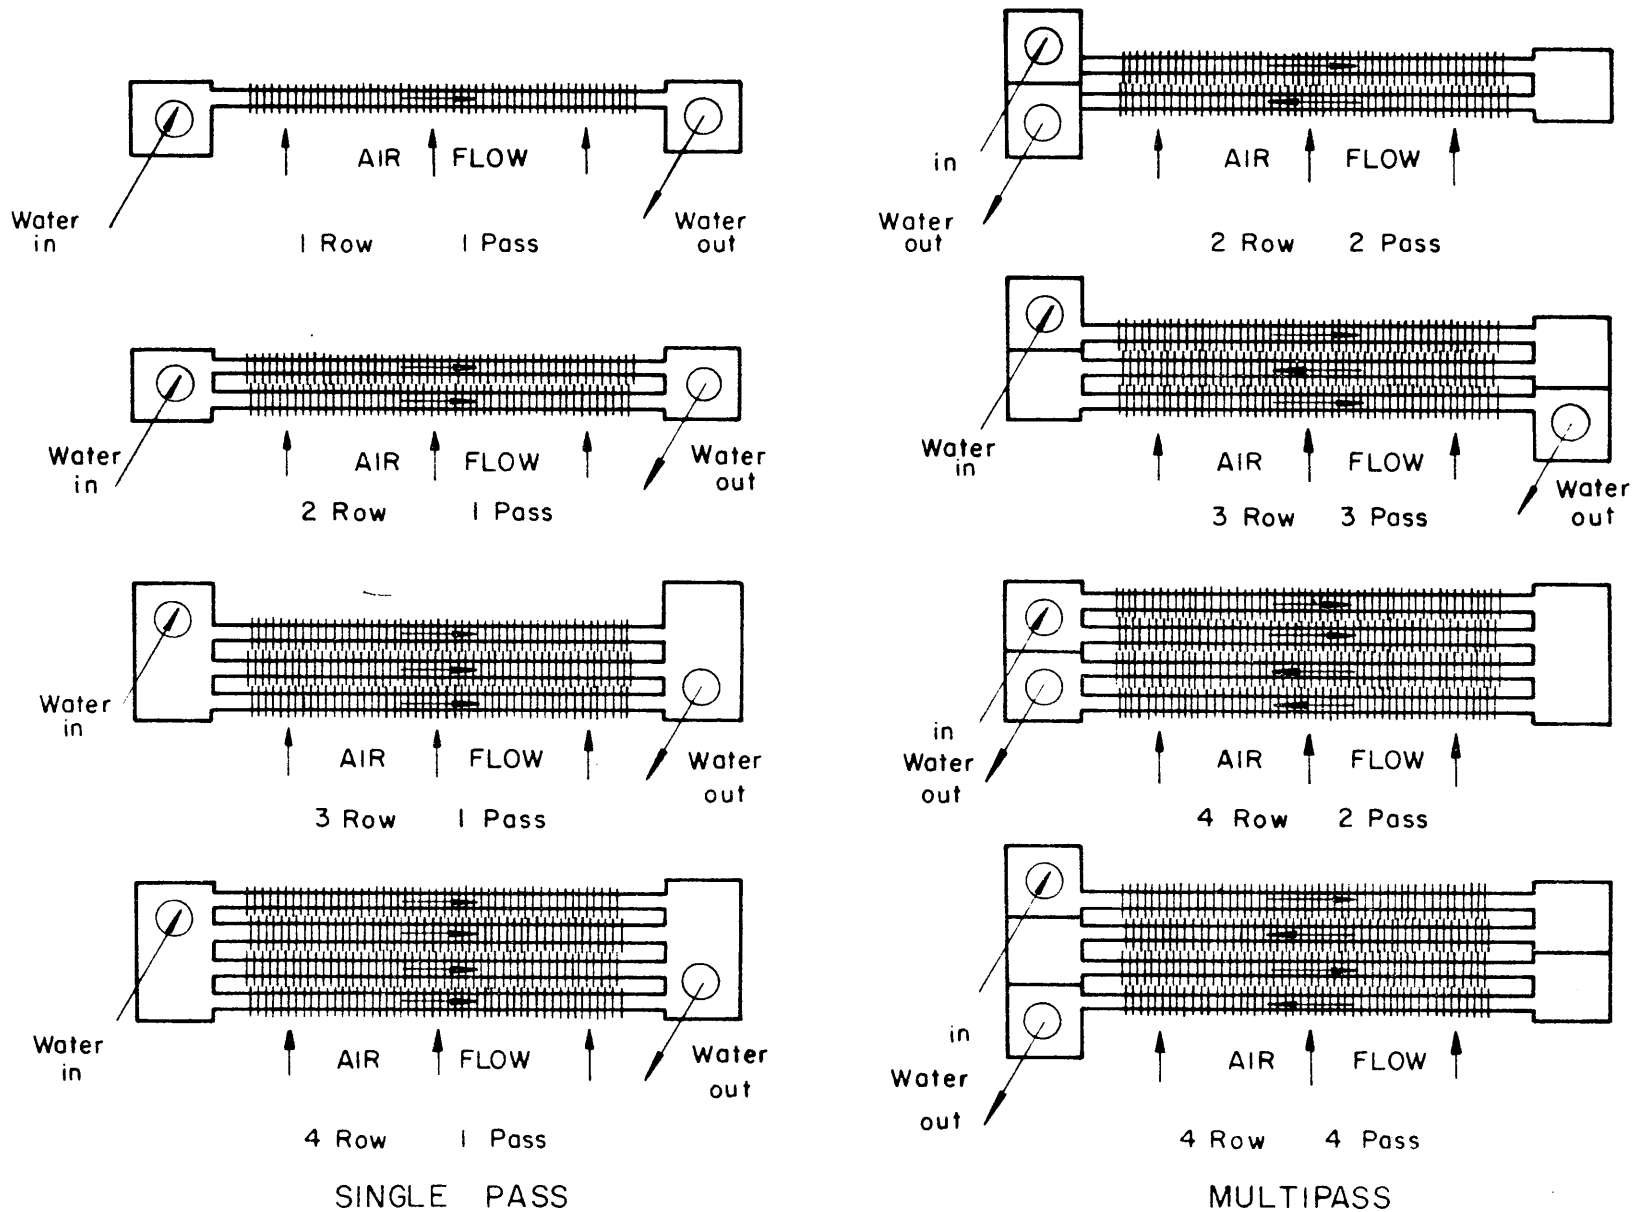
TUBE ROW AND PASS ARRANGEMENTS STUDIED
